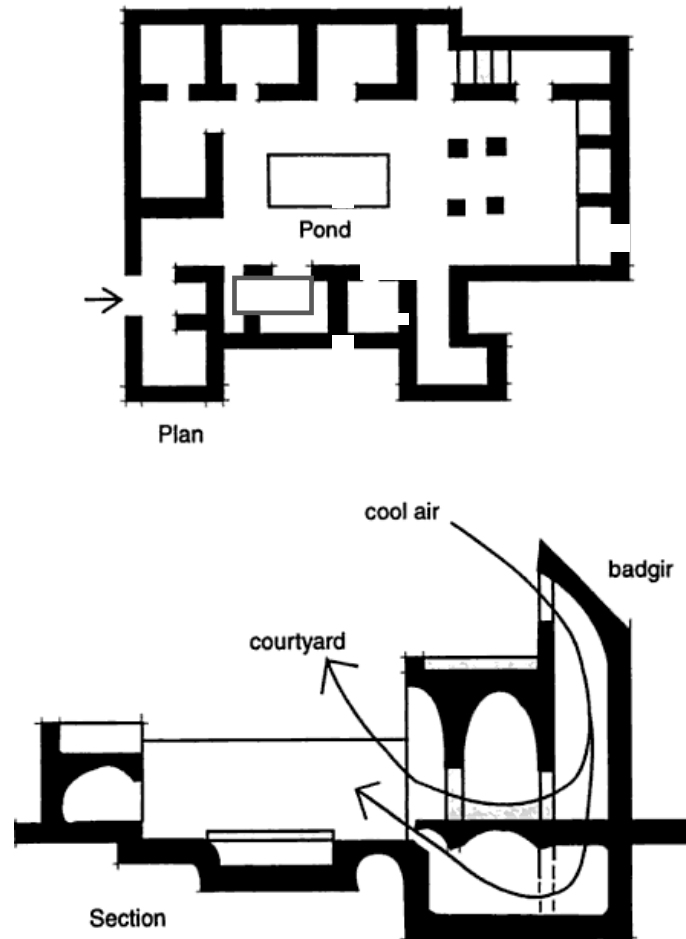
Plan and section of Persian House (Noor, 1986)
